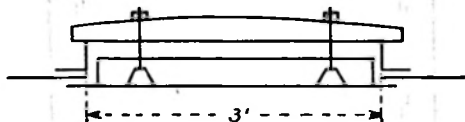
Cross section of opening temporarily closed by plate or battened boards held up by bolts and cross pieces
